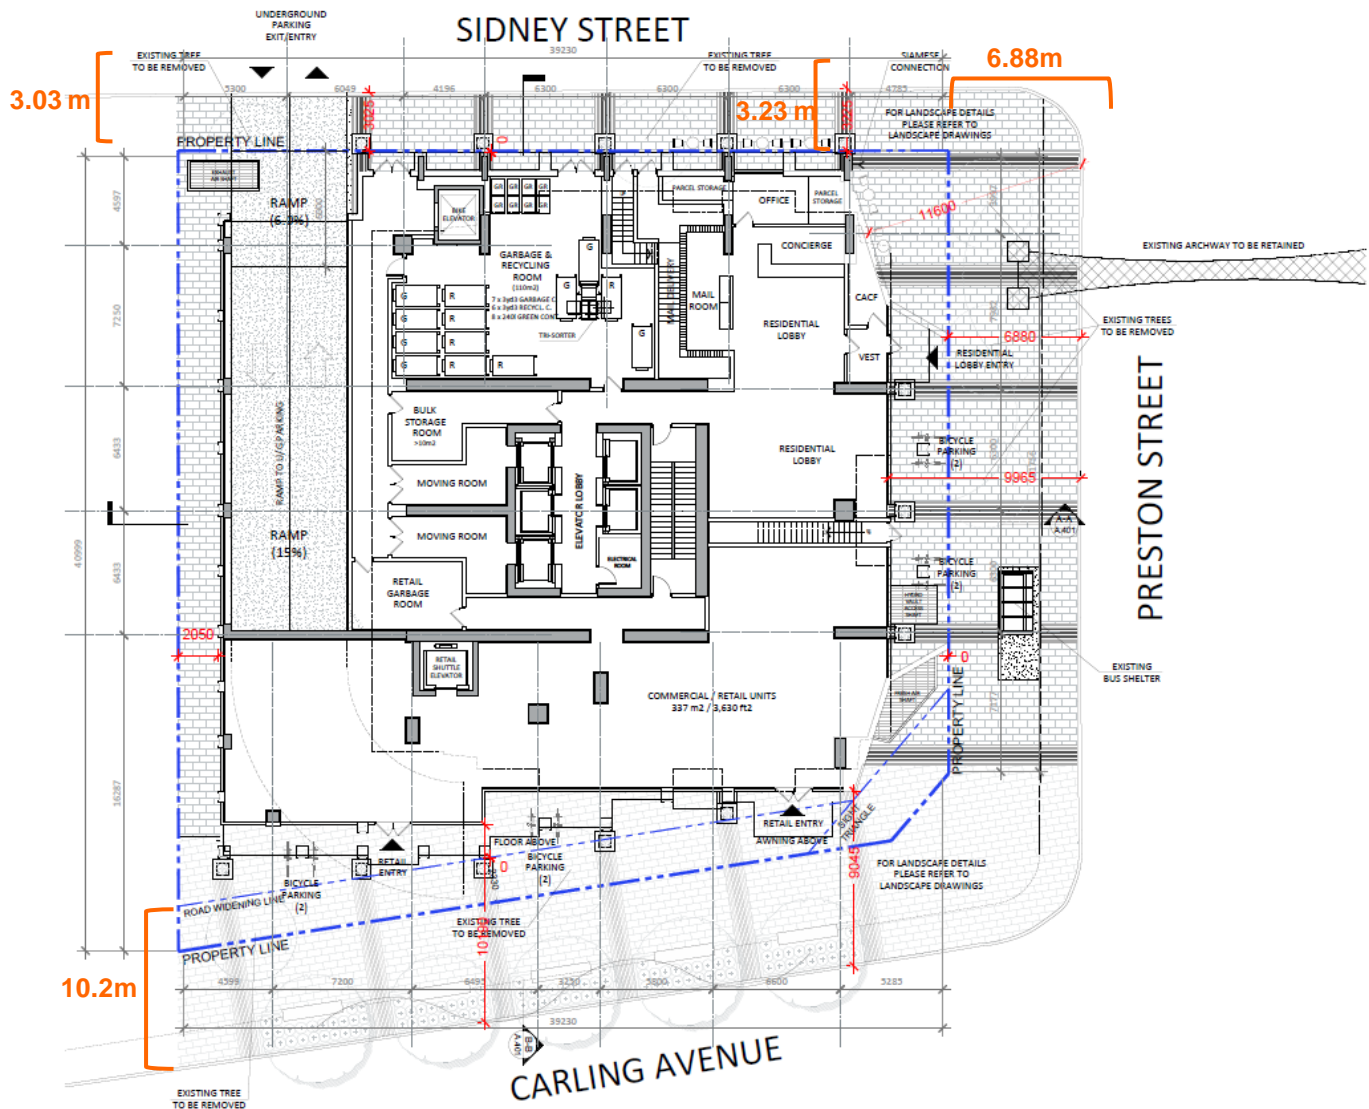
Proposed Development - Ground Floor Plan with sidewalk widths indicated
